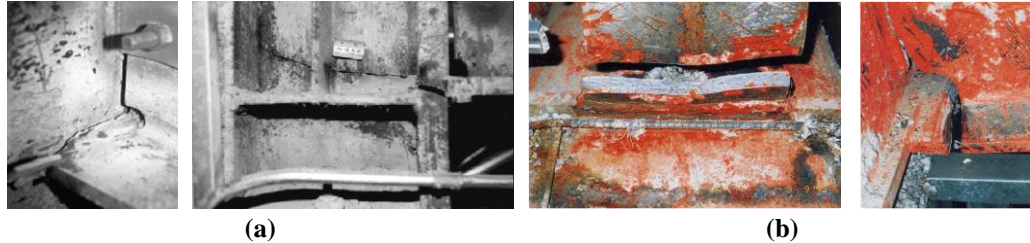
Brittle fracture observed in the beam-to-column connection after (a) 1994 Northridge earthquake and (b) 1995 Kobe earthquake
